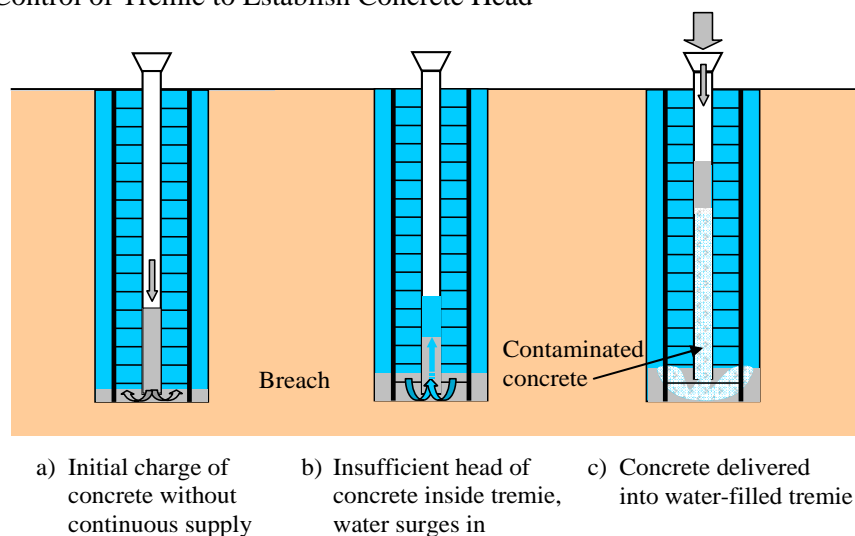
Breach of Tremie Due to Failure to Establish Concrete Head
